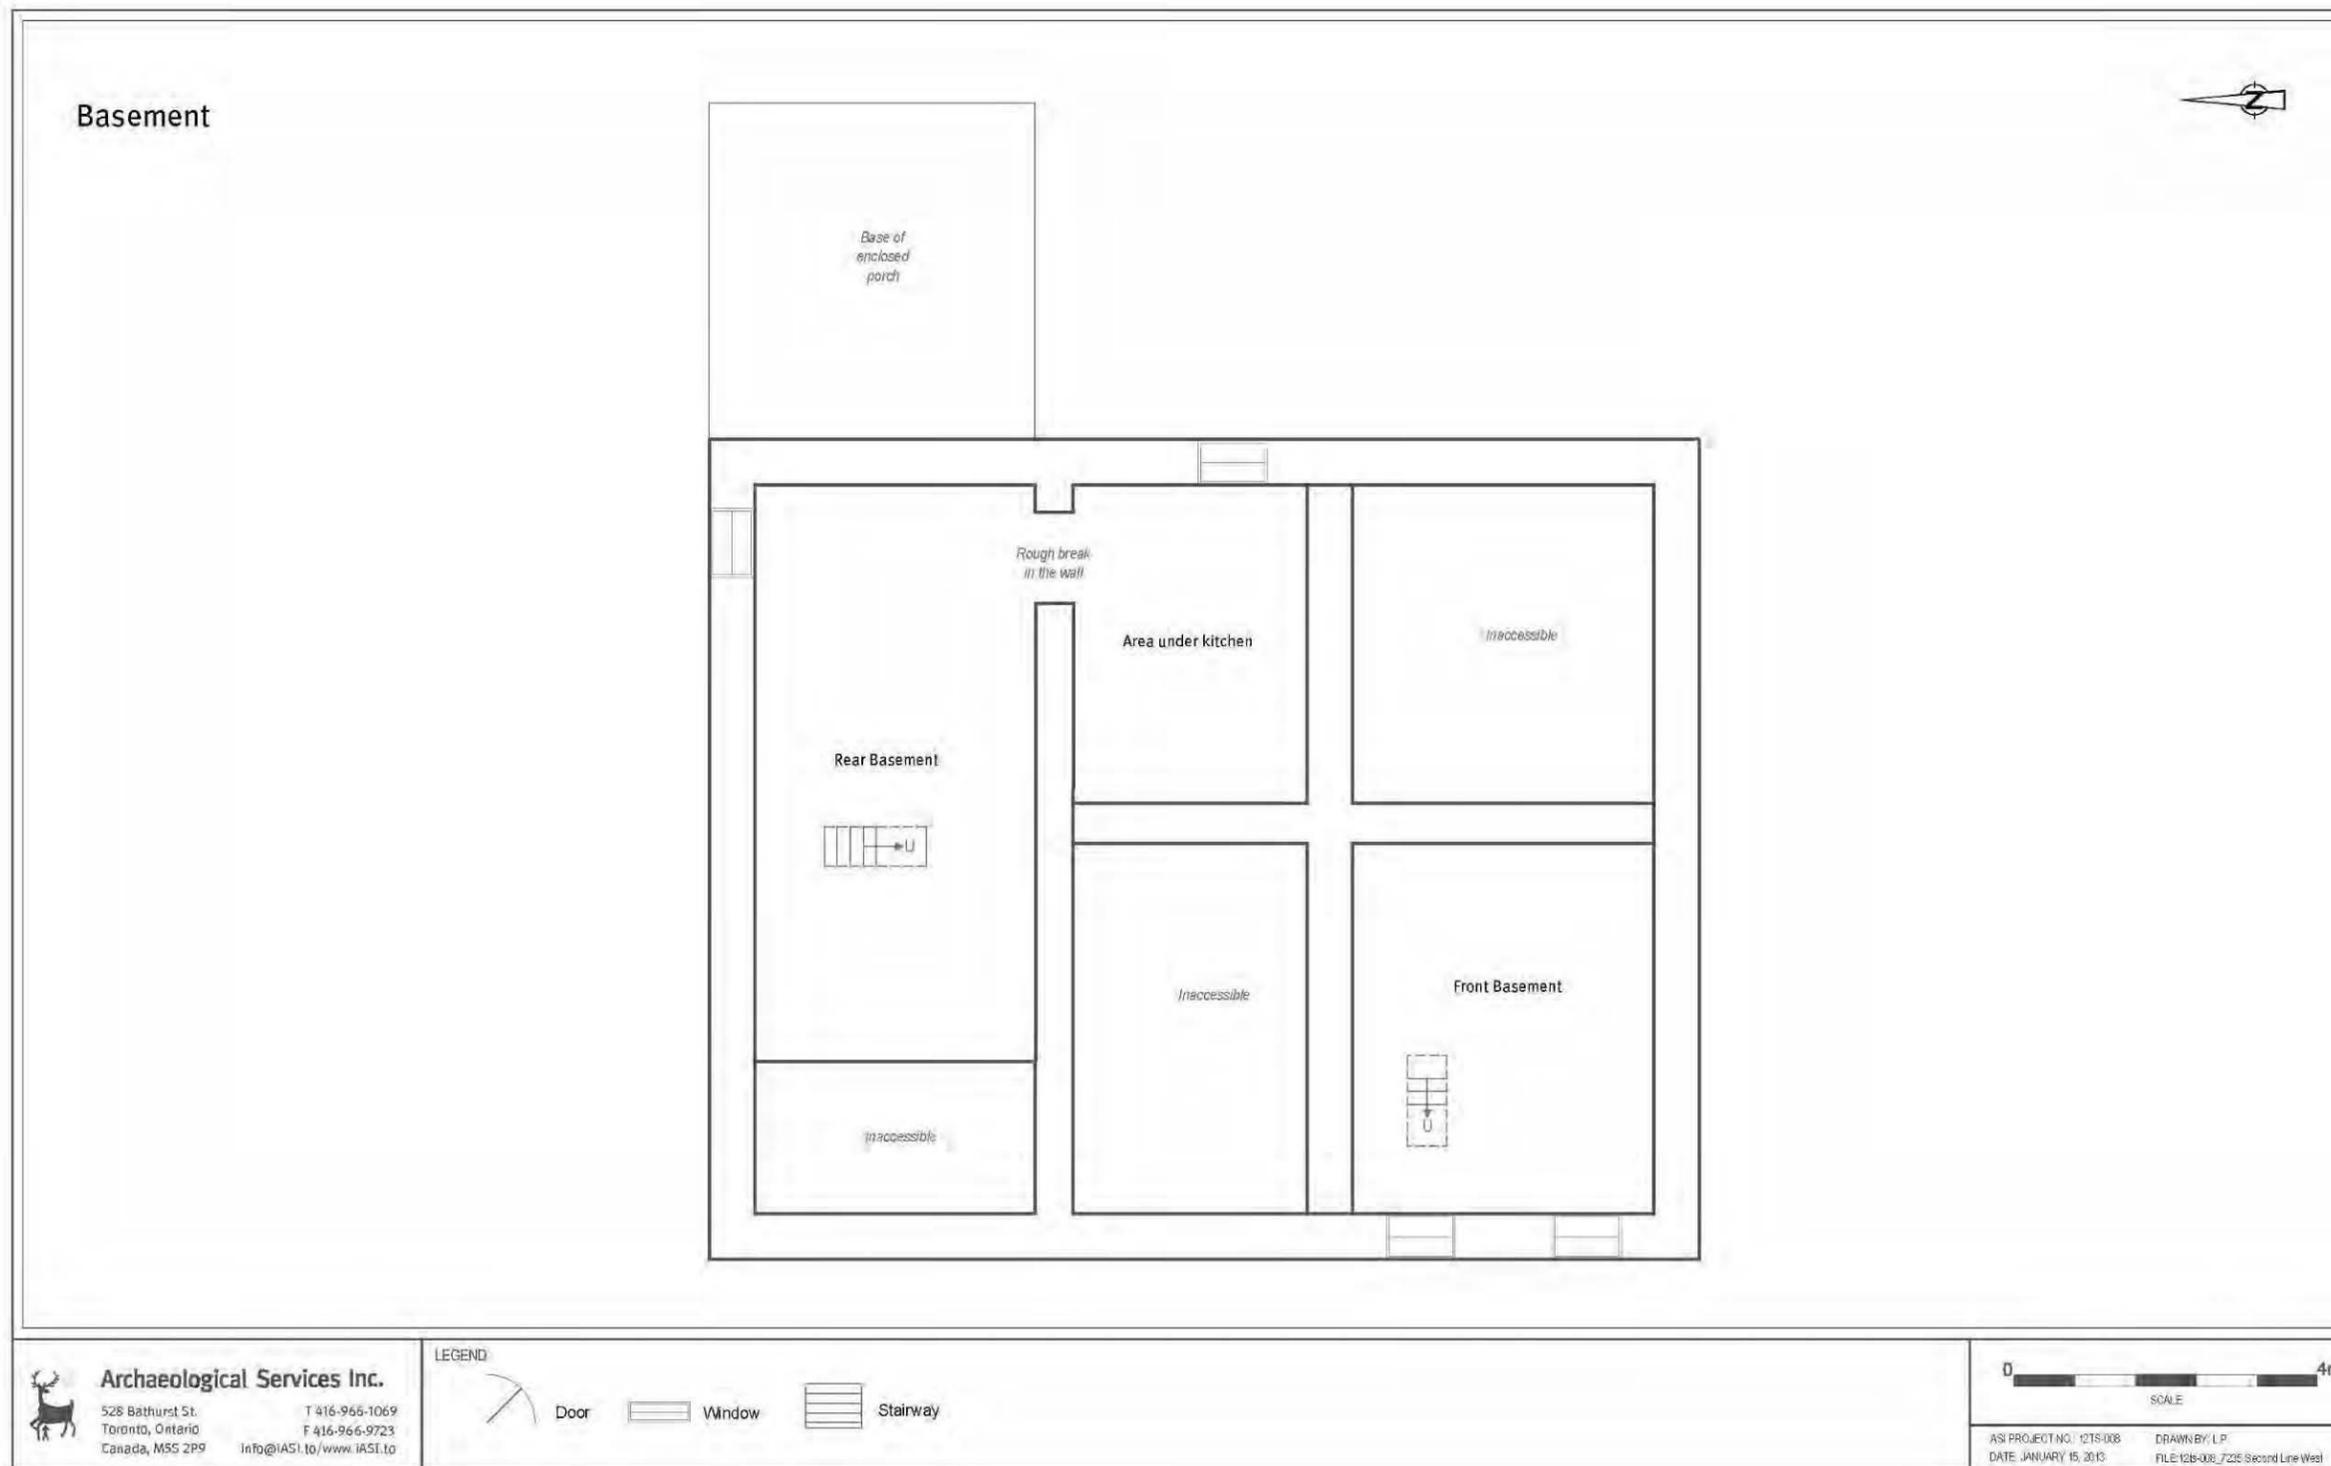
Schematic floor plan of the basement at 7235 Second Line West.
